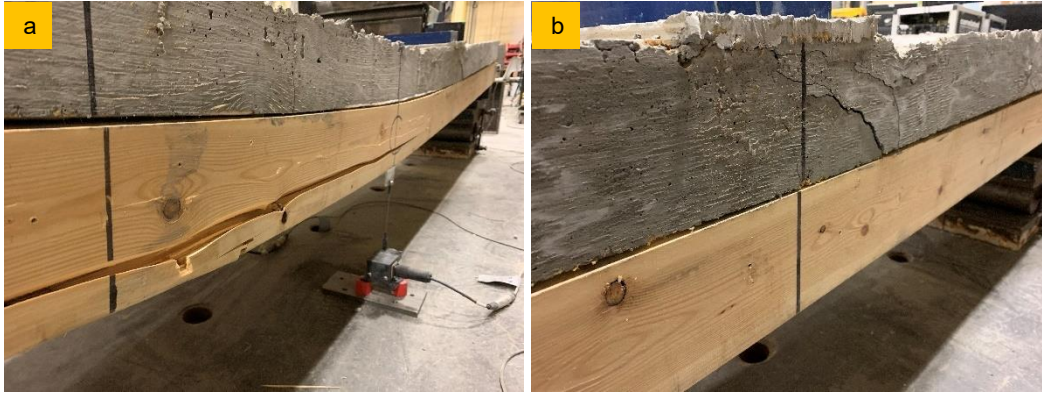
a) Timber fracture and b) concrete crack in the tension zone; in specimen (#8) GLT4.5-C100-115-45°-S250
